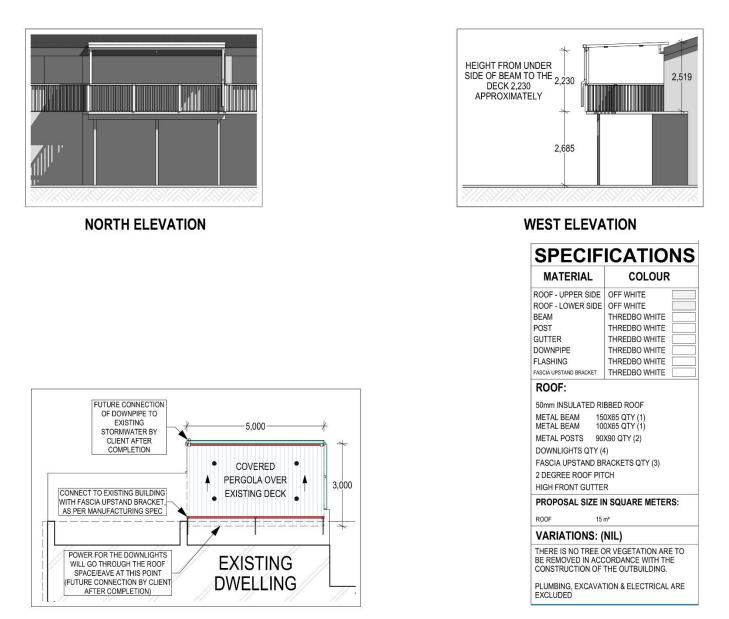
Site Plan of the Proposed Pergola Source: Australian Outdoor Living (March 2019)
